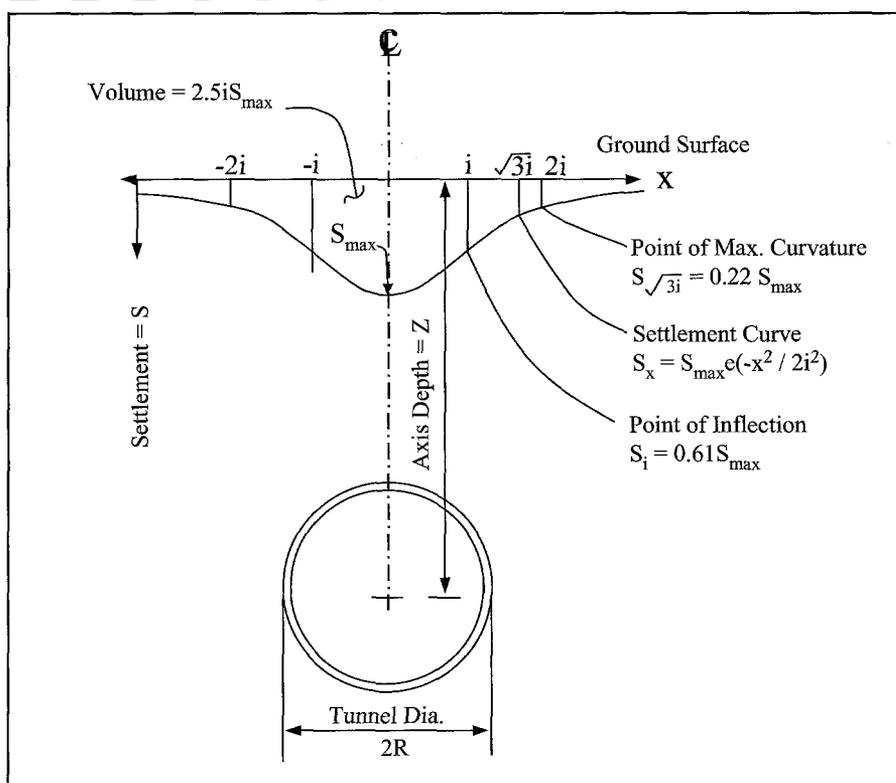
(i) – Cross Section of Settlement Trough Above Tunnel (Adapted from Peck, 1969)
